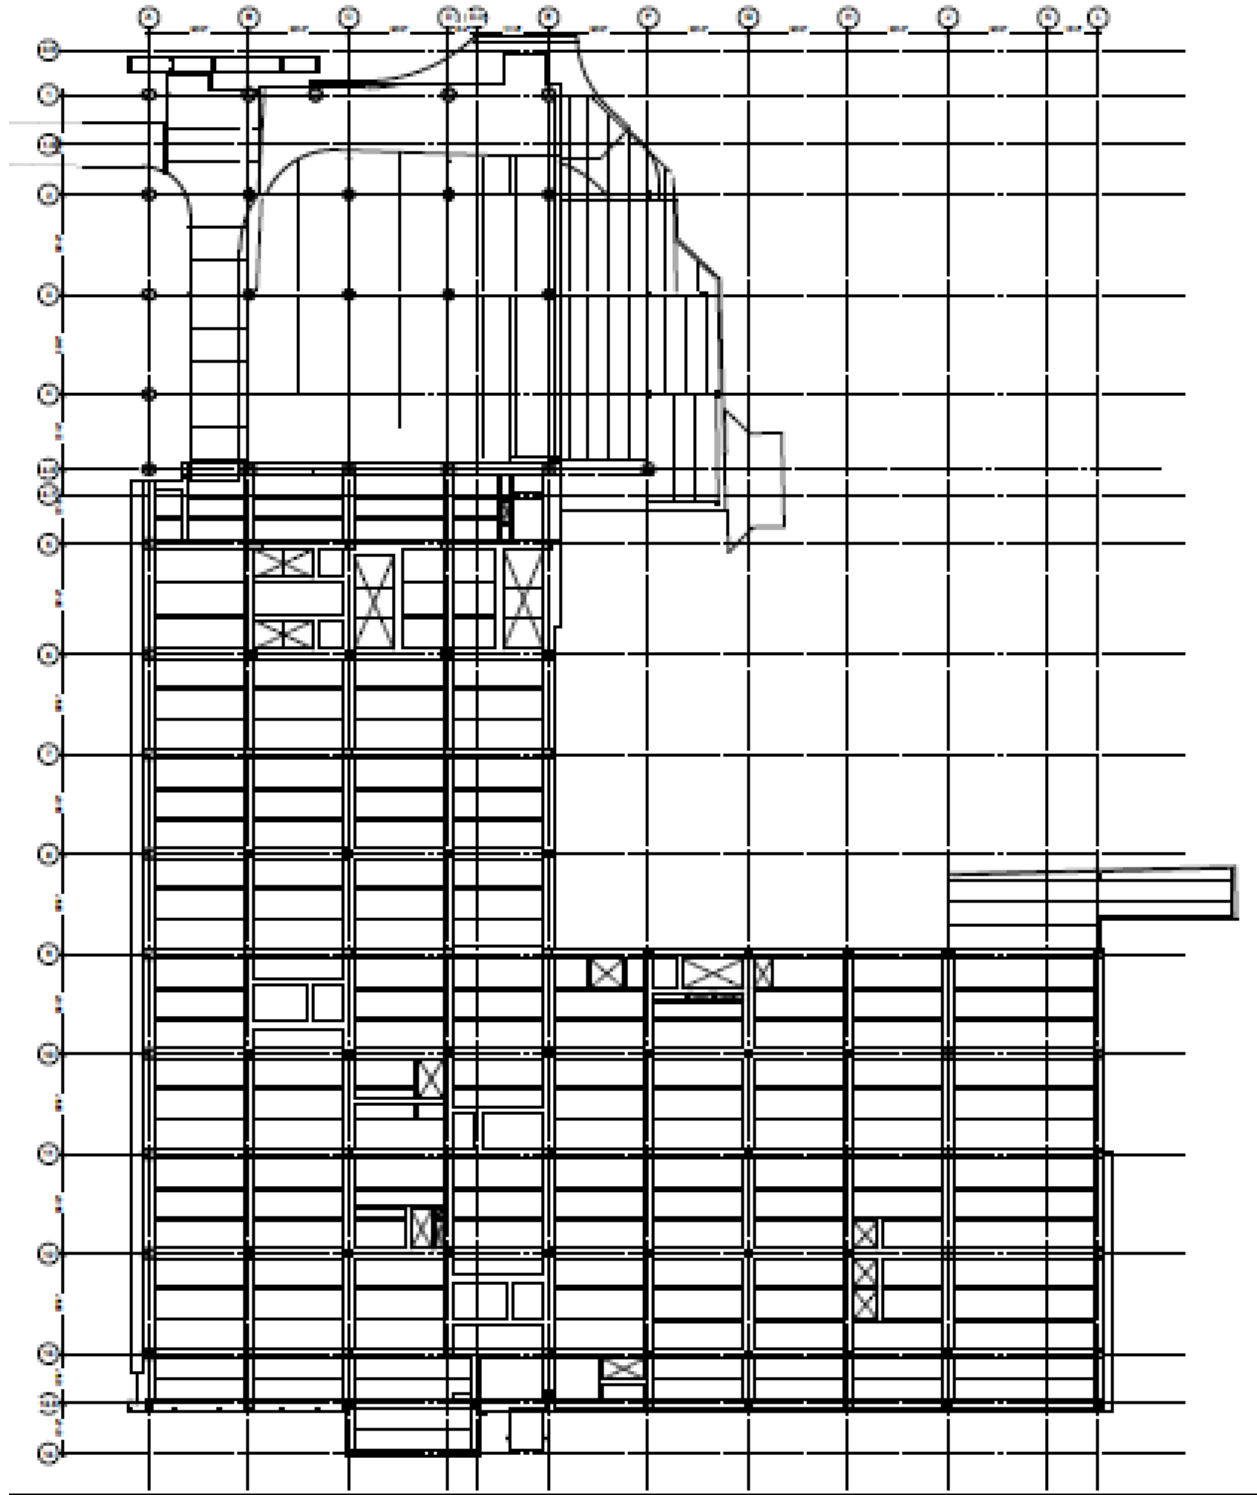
| Typical Structural Floor Plan for Floors 1-3 (Walter P. Moore)
